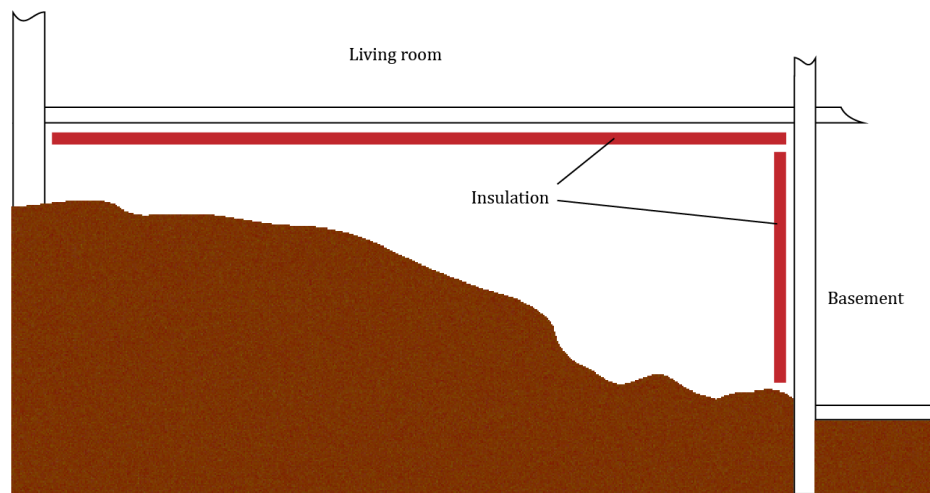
Insulation is applied to the floor above the crawl space and to the wall adjoining the basement.
